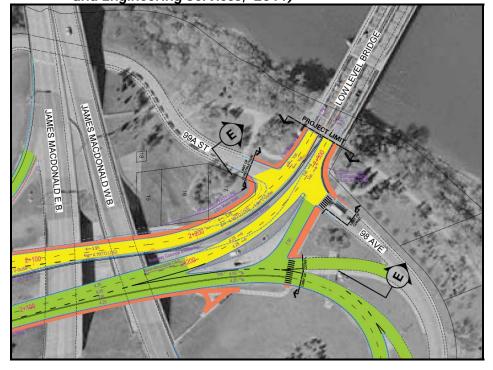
Retaining Wall 2 Construction Adjacent to River Valley
